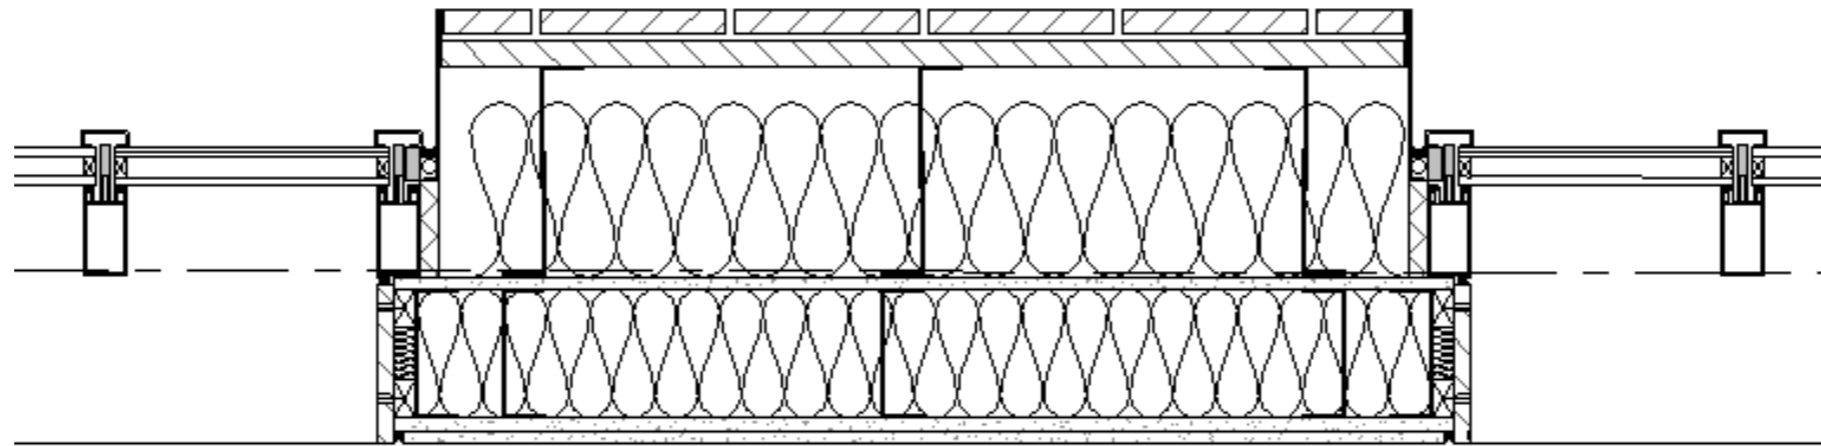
Rainscreen Brick Plan Detail (Author, 2021)
